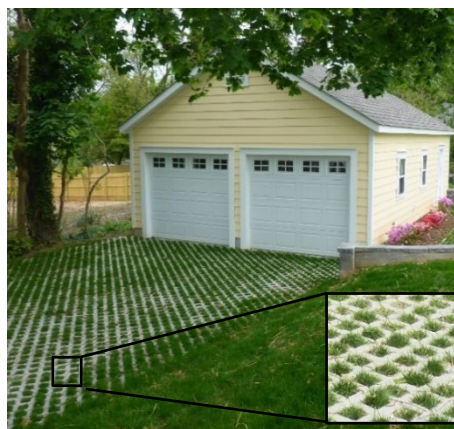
Pavement was removed and replaced with 720 square feet of turfstone permeable pavers at a residential property.
